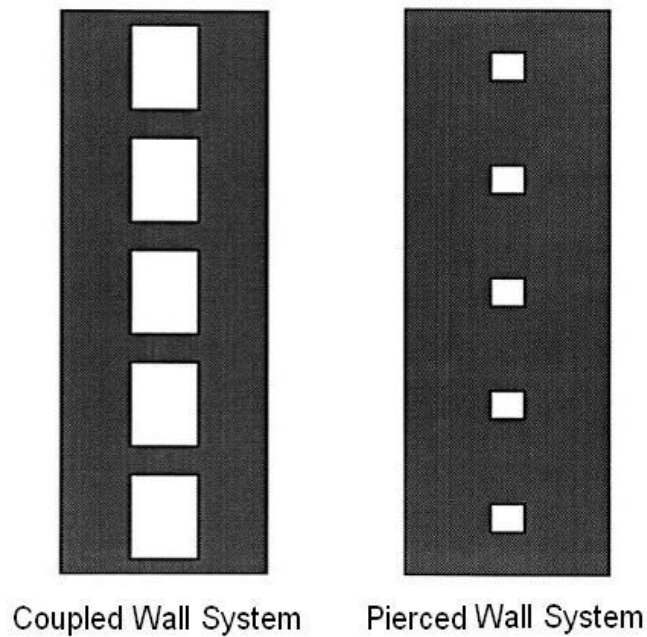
Types of Structural Wall Systems (Aejaz and Wight (1990))
